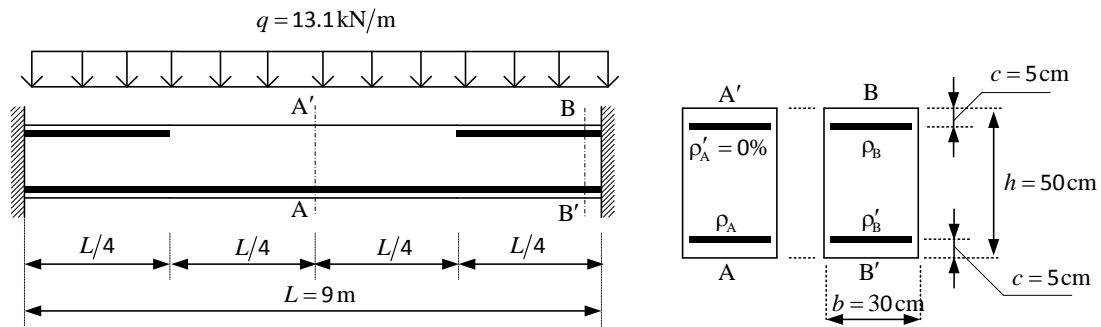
Second application example: reinforced concrete built-in beam and longitudinal reinforcement scheme.
